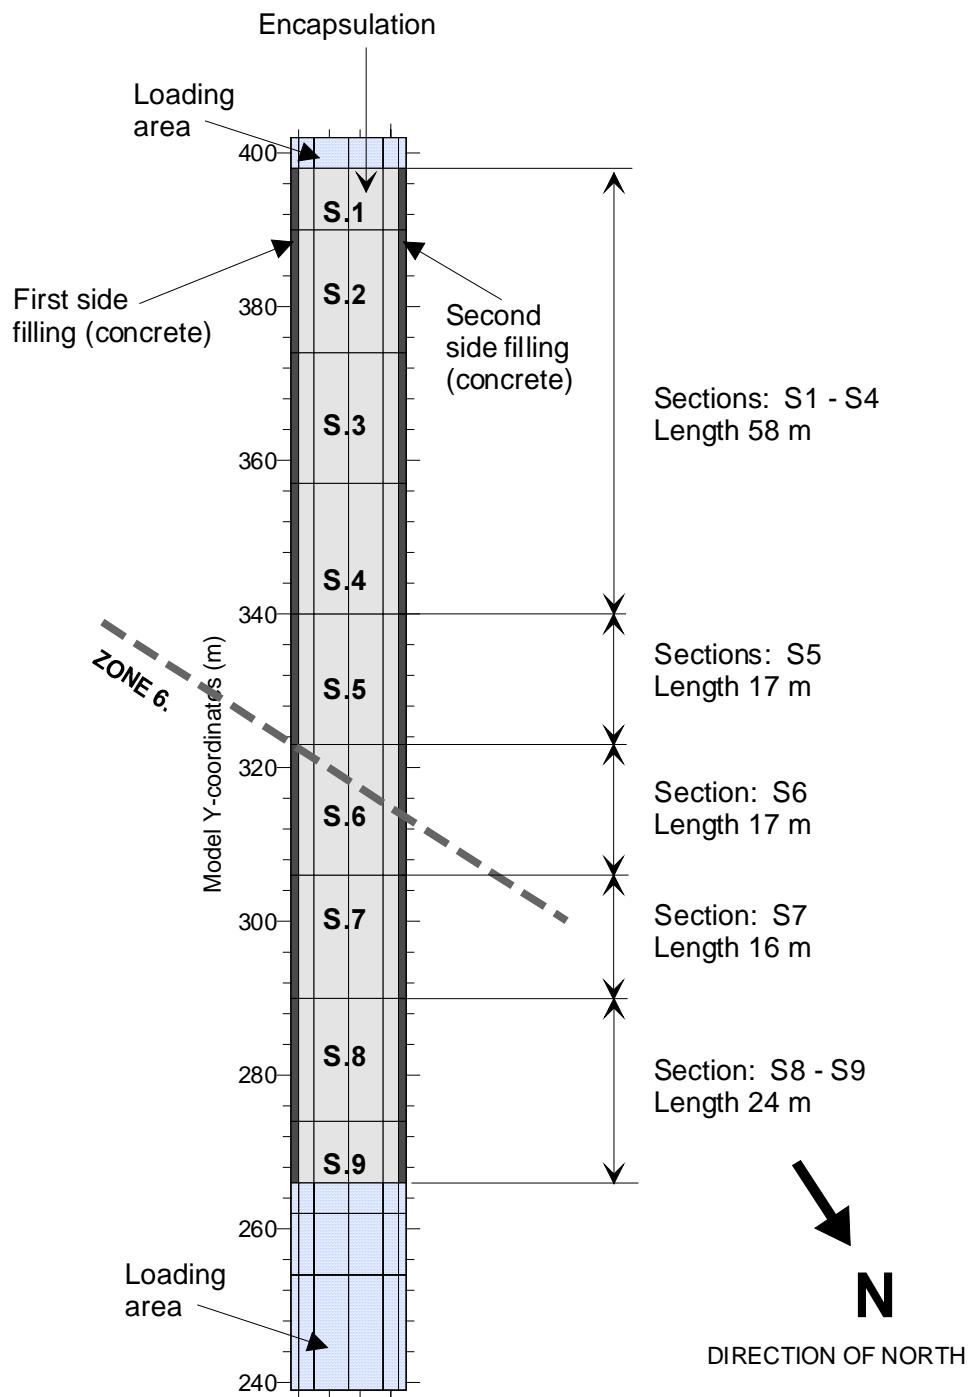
A vertical cross-section through the BTF tunnel, as defined in the detailed model.
